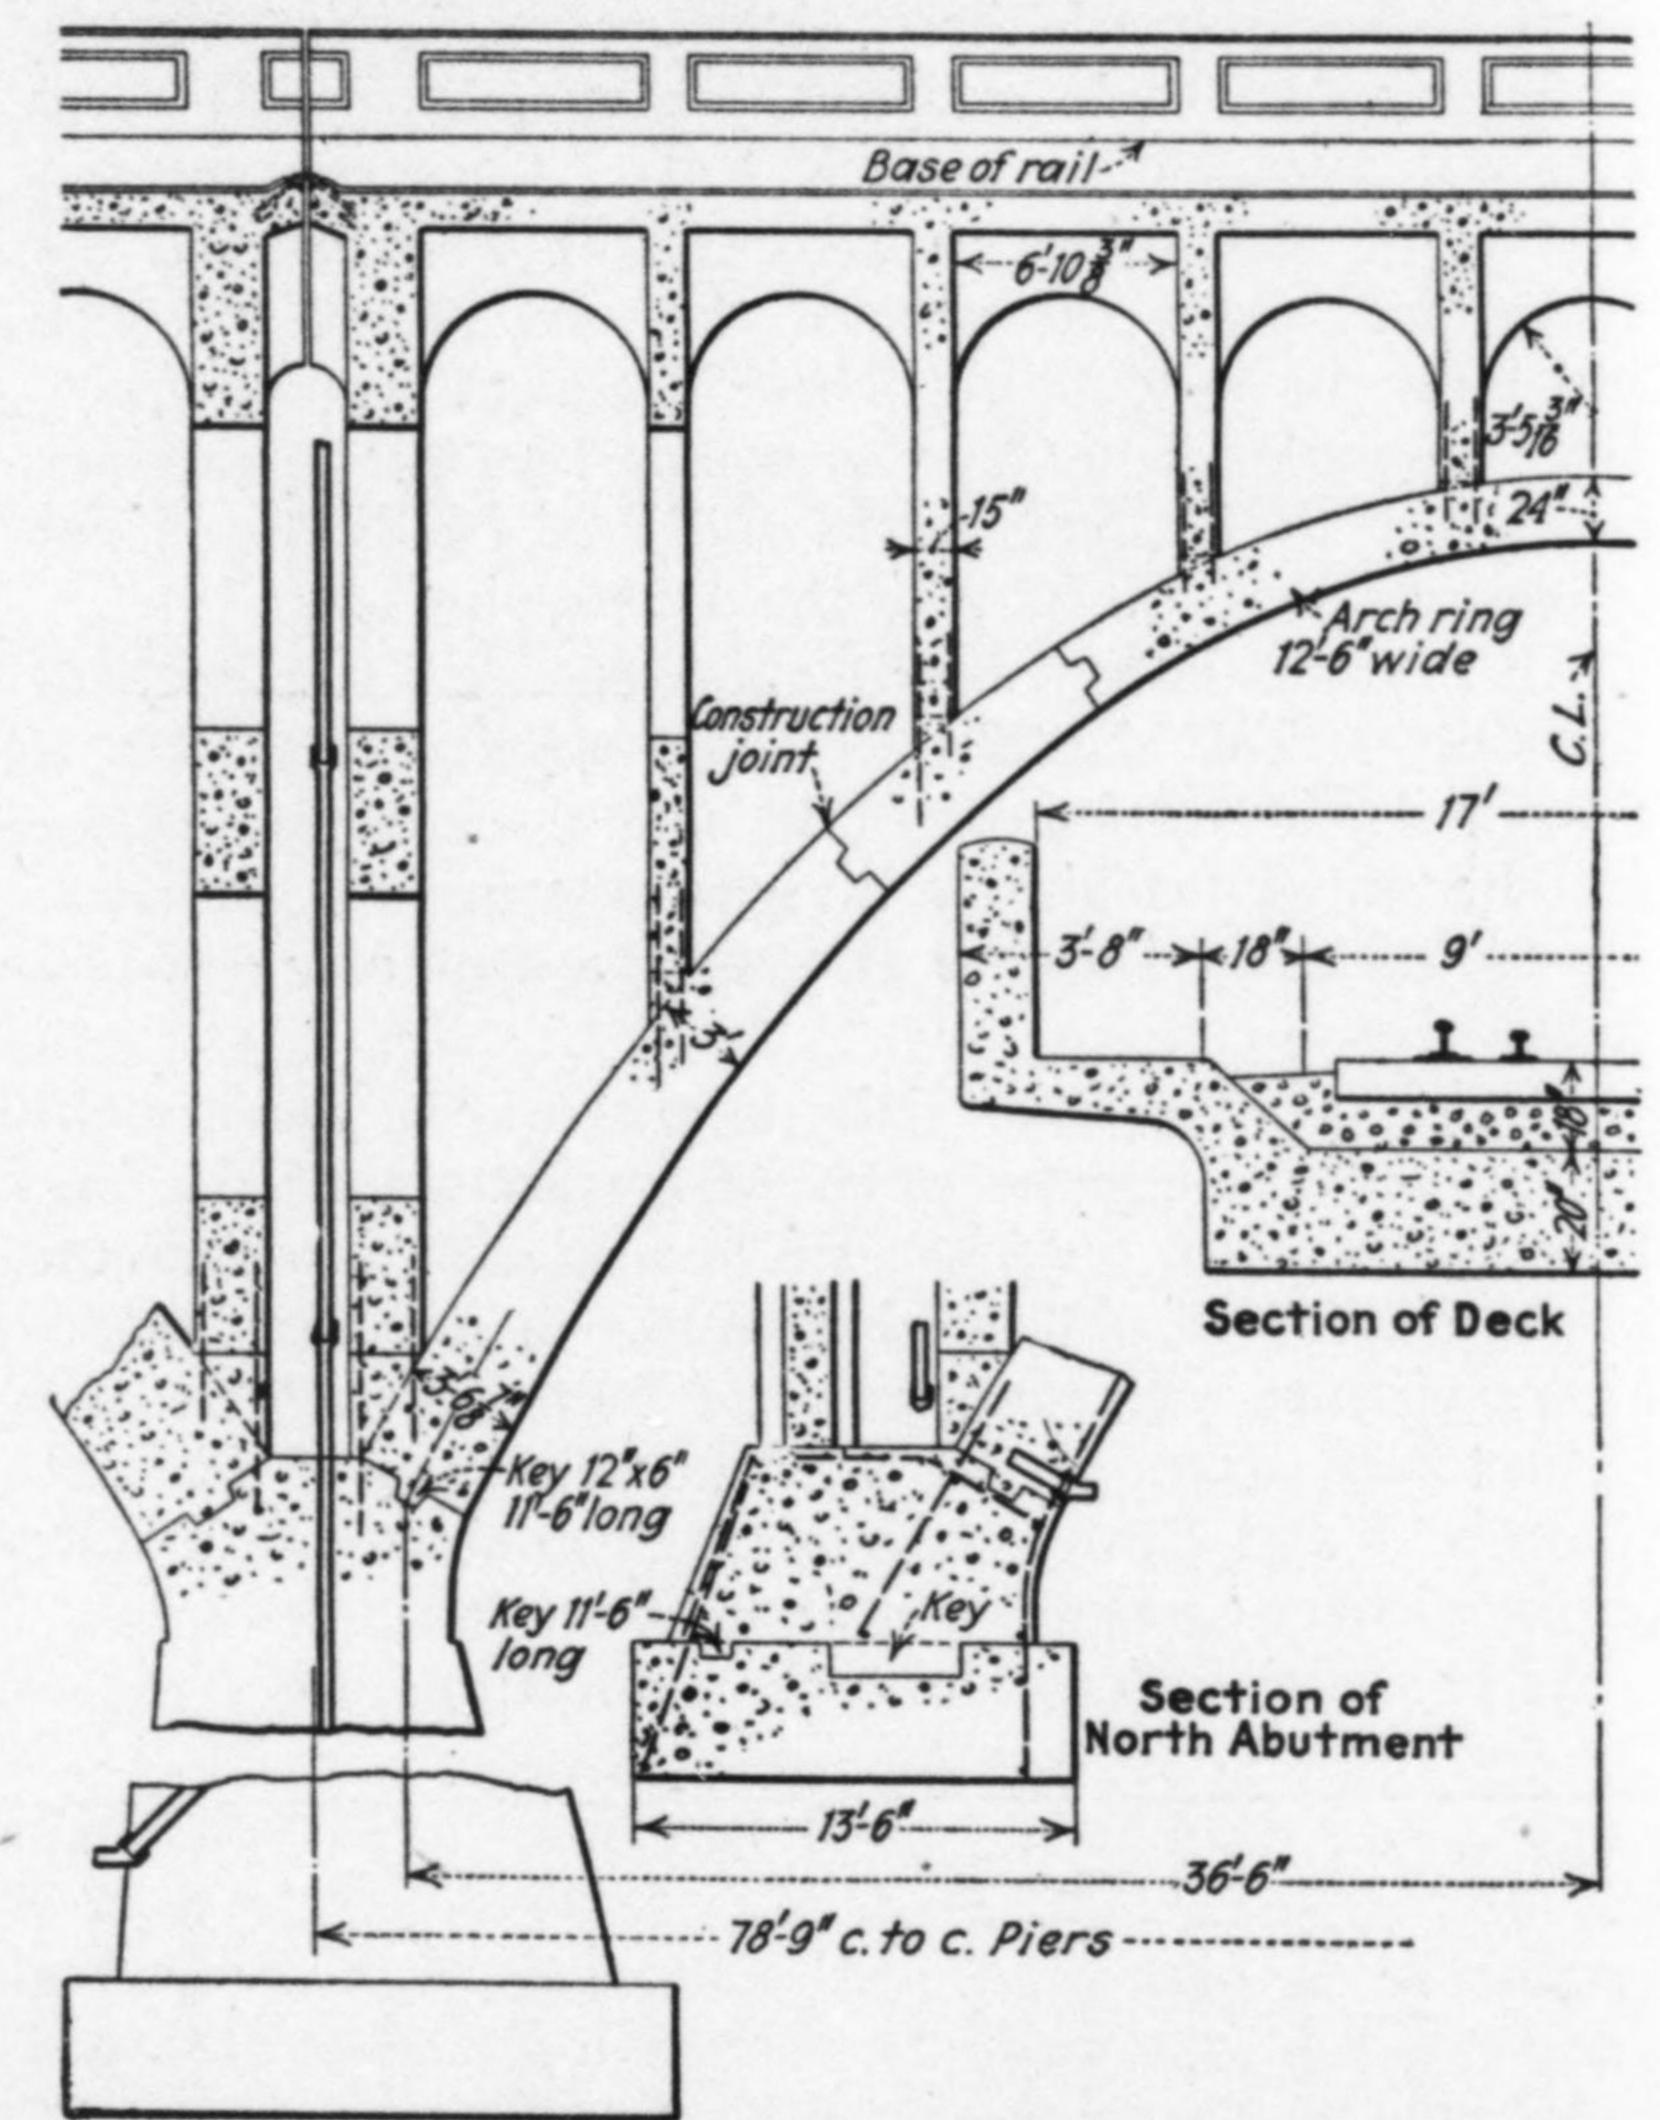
TYPICAL SPAN OF FLYING-FIELD ROAD VIADUCT
